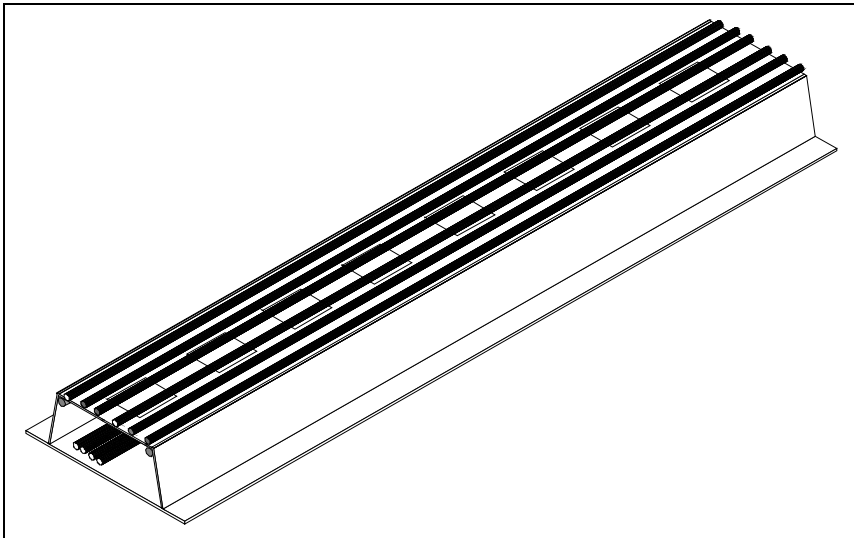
Illustration of steel component of middle beam. End plates and hoop reinforcement not shown.
